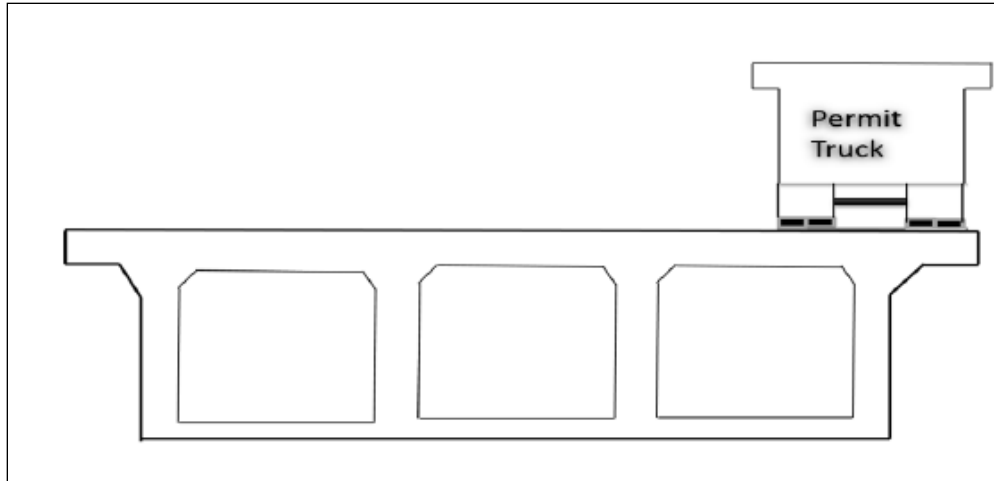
Sectional view of the Box Girder with Truck Load on the Exterior Girder (Vaziri, 2016)
